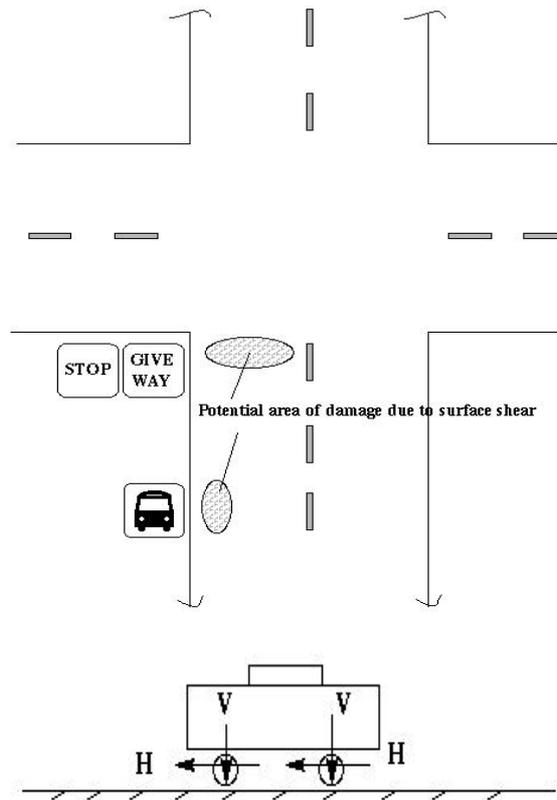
Potential failures of road pavement due to surface shear.
